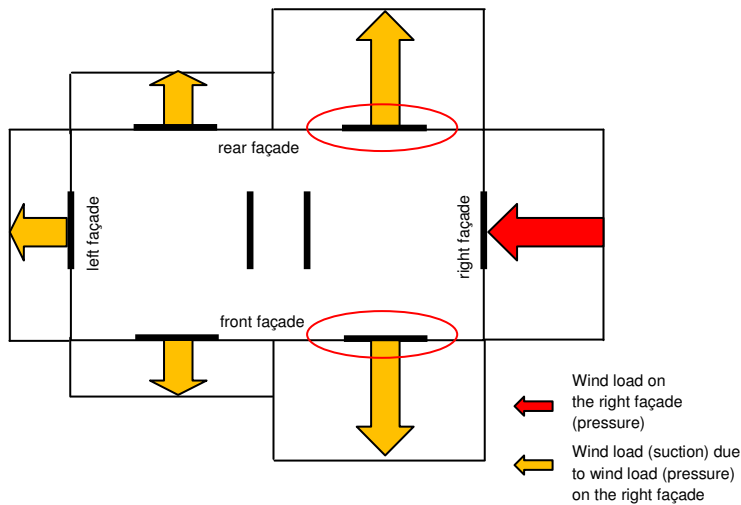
Example floor plan of in-plane and out-of-plane loaded stability elements in buildings adapted from [NEN 6702:2007].
